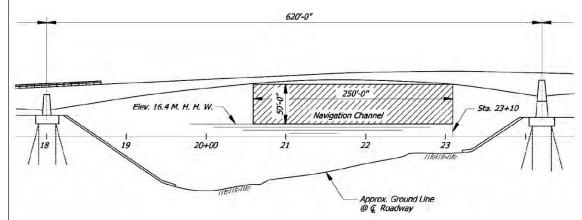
Bridge elevation view indicating navigation channel width dimensions. (Source: Alaska DOT)
